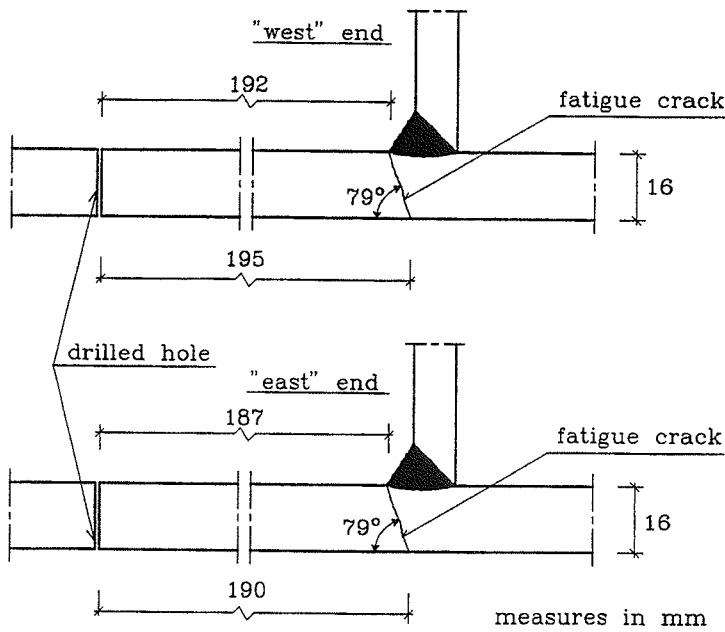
Fatigue crack in chord at edge of weld. Test No. W1.
